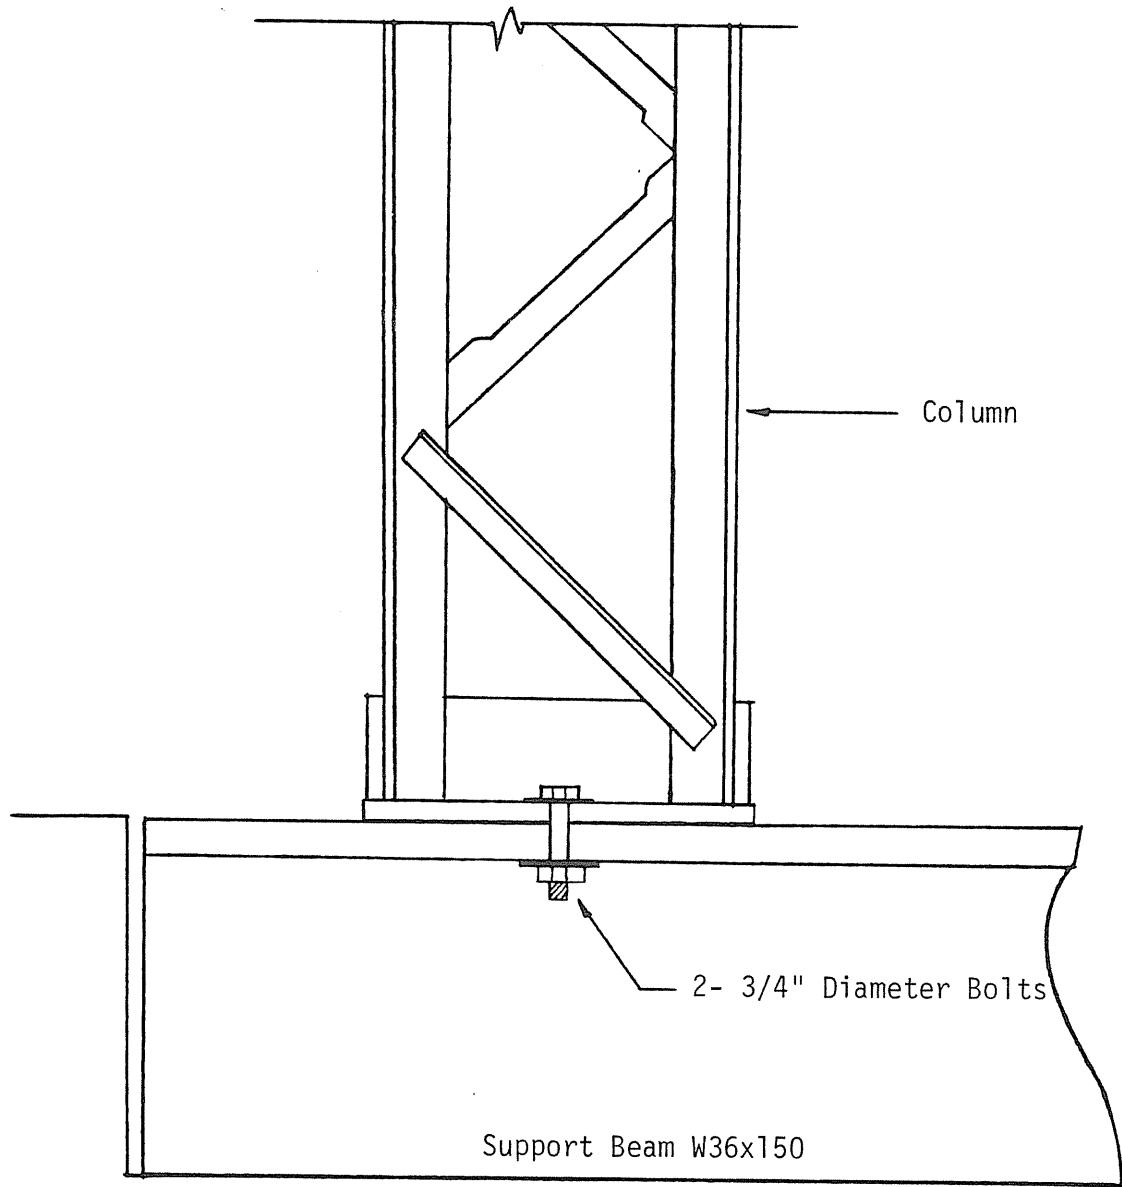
DETAILS OF COLUMN-TO-REACTION FLOOR CONNECTION
